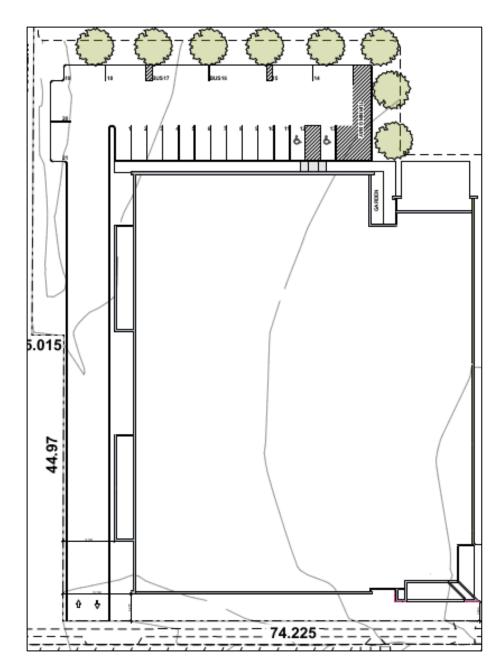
PCYC Facility (Proposed S4.55(2) Modification Driveway and At-Grade Carpark Plan)
